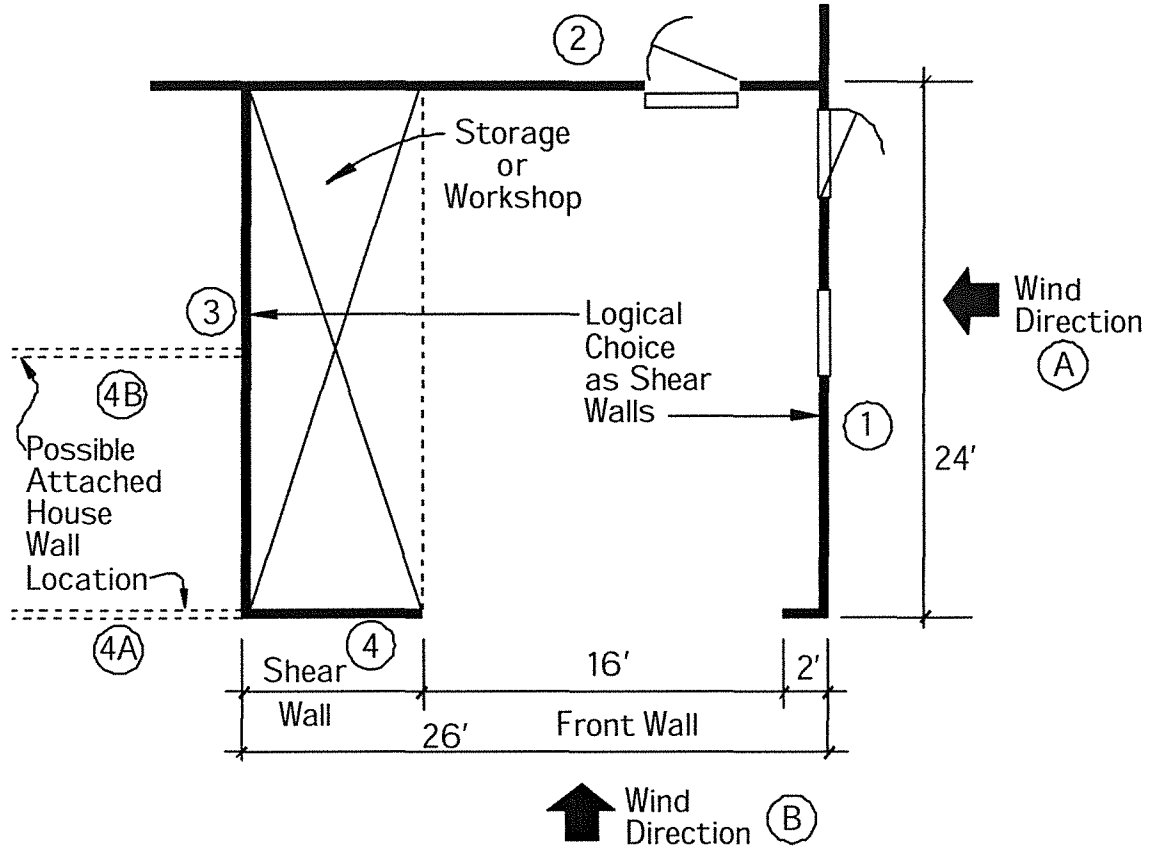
Improved Garage Front Wall Shear Resistance
